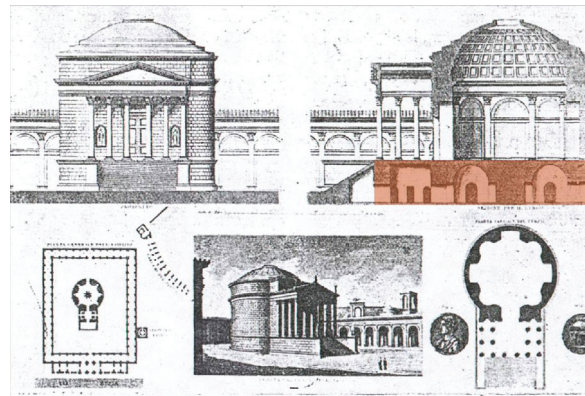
Reconstructive plans, front, section and view of the Mausoleum [DIE11]. The red layer, over the section, point out the still existing part of the central monument.
